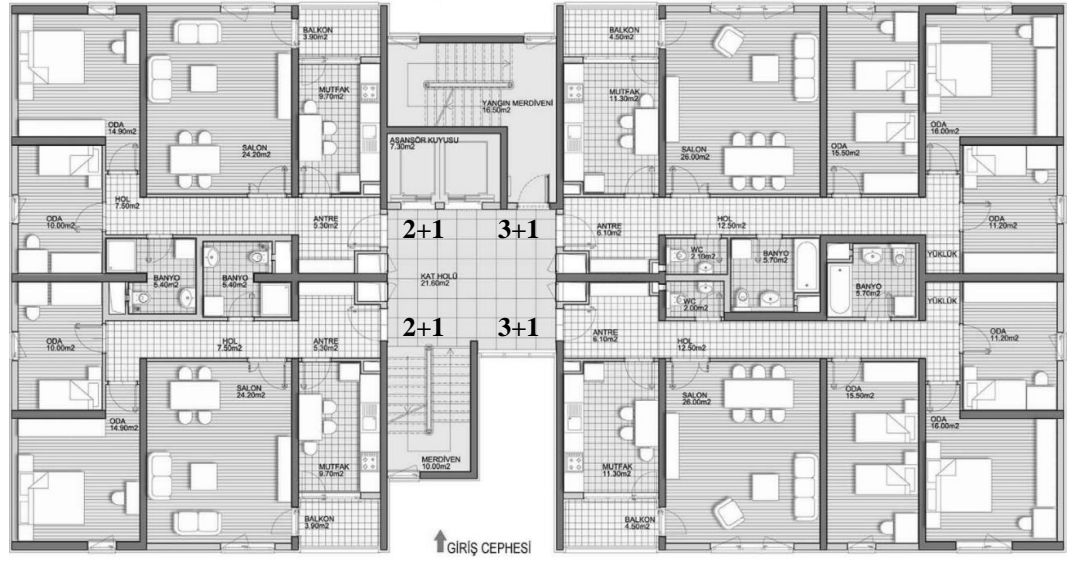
C Block Floor Plan 2+1 and 3+1 Apartments
